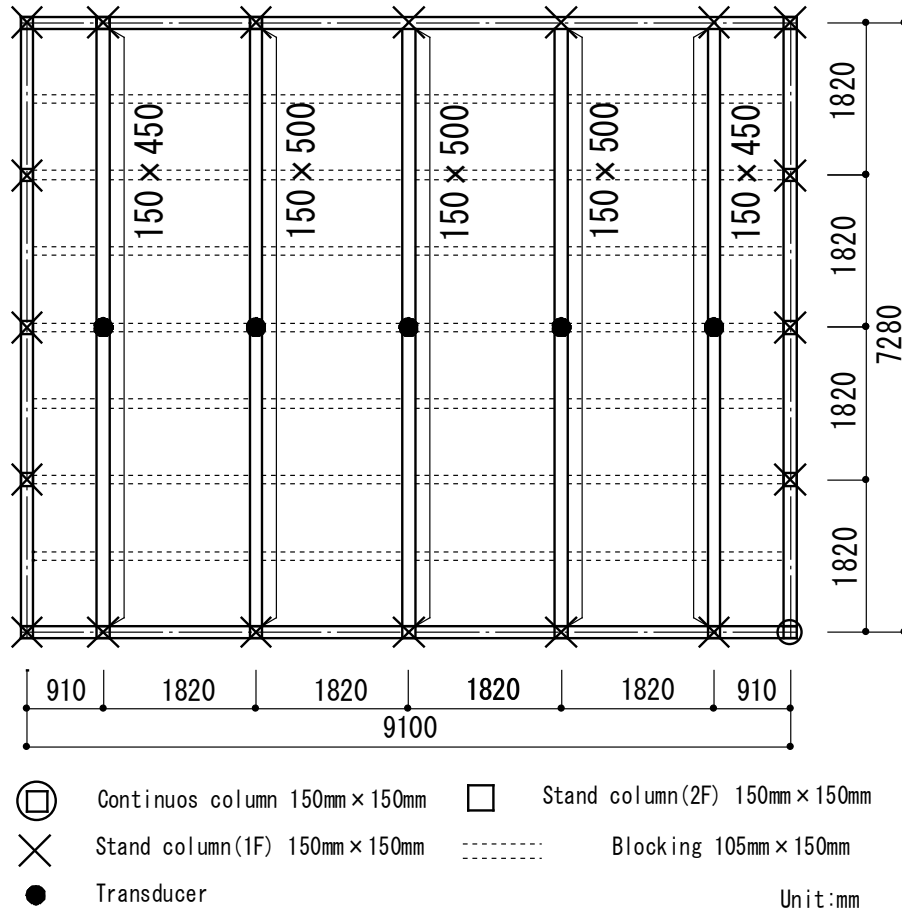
Upstairs floor framing plan of a measured room in elementary school A.
